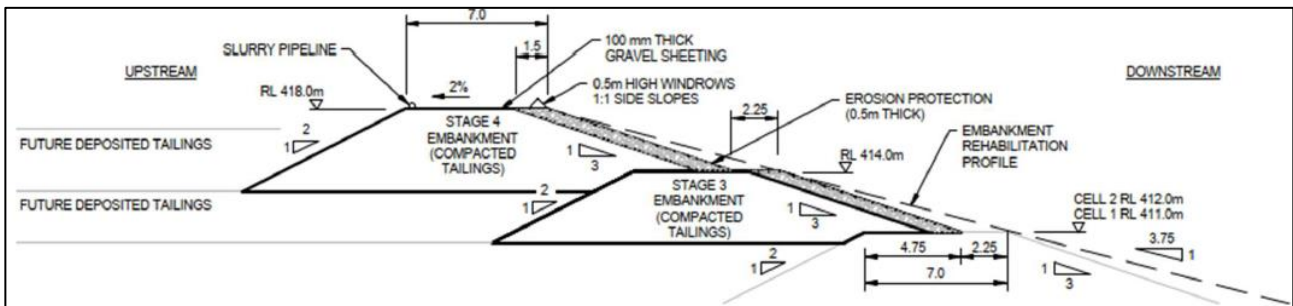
Cross section of TSFs Cells 1 and 2 perimeter embankment.
